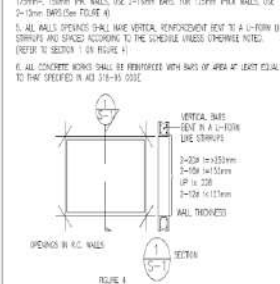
TYPICAL CONNECTION DETAILS OF CONCRETE WALL REINFORCEMENT
